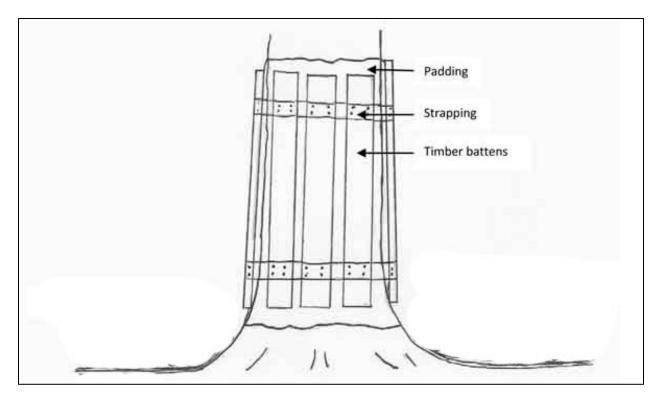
Figure C: Detail of suitable trunk and ground protection for Trees 4, 5, 6 and 22
